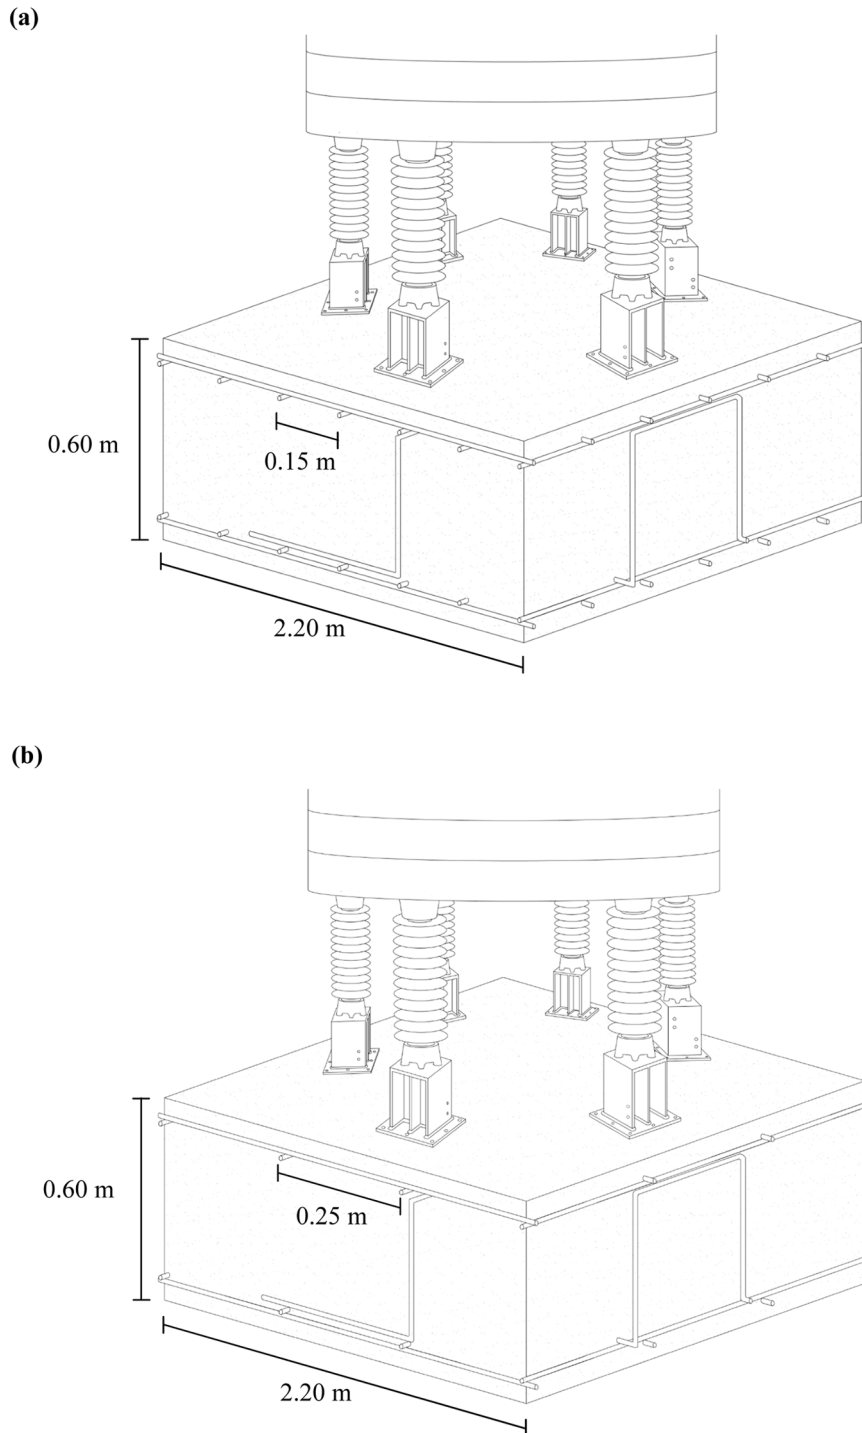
Schematic view of the raft foundation concept for the air-core shunt reactor and the compared reinforcement layouts: (a) as-built GFRP-reinforced solution with 12 mm bars at 150 mm spacing on both faces; (b) steel alternative adopting a code-efficient mesh (14 mm bars at 250 mm spacing on both faces). The reactor supports pedestals and the corresponding load-transfer zones are shown for reference.
